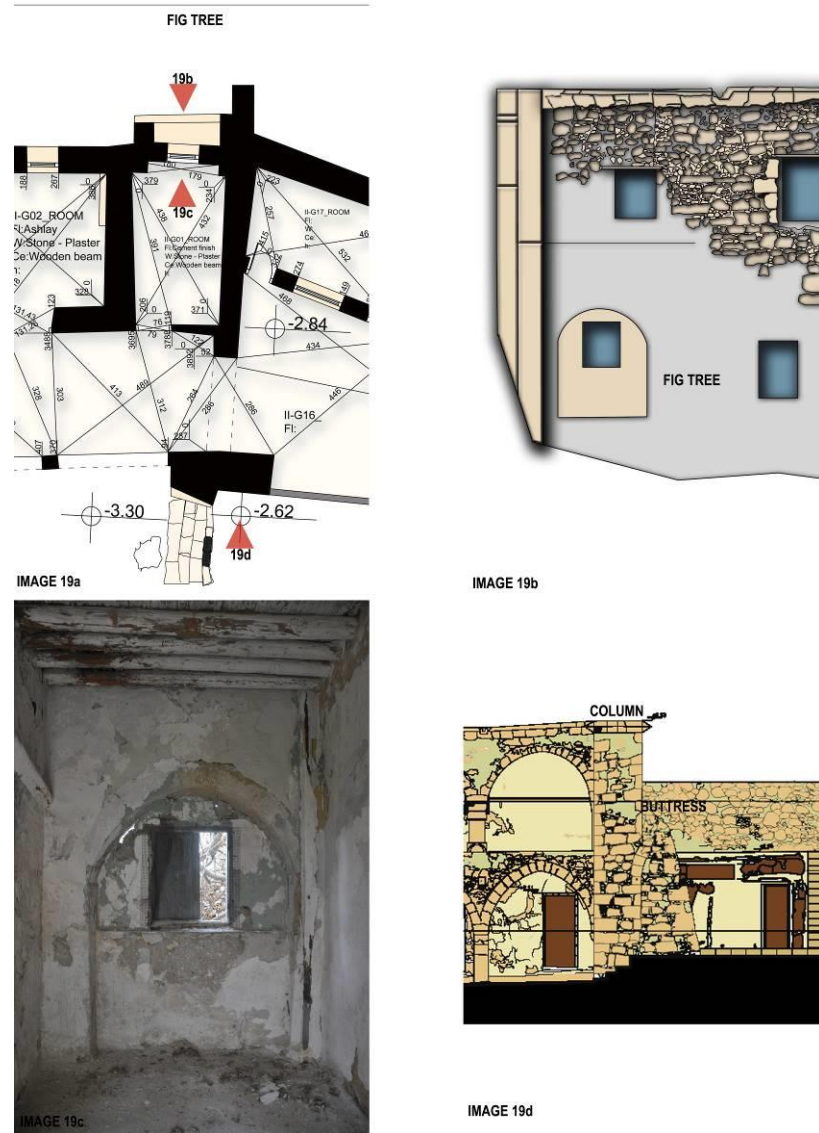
(a) Plan of the room II-G 01 (b) Survey Drawing of the North Façade of the room (c) Image of the room's north wall (d) Survey Drawing of the Column Footing
